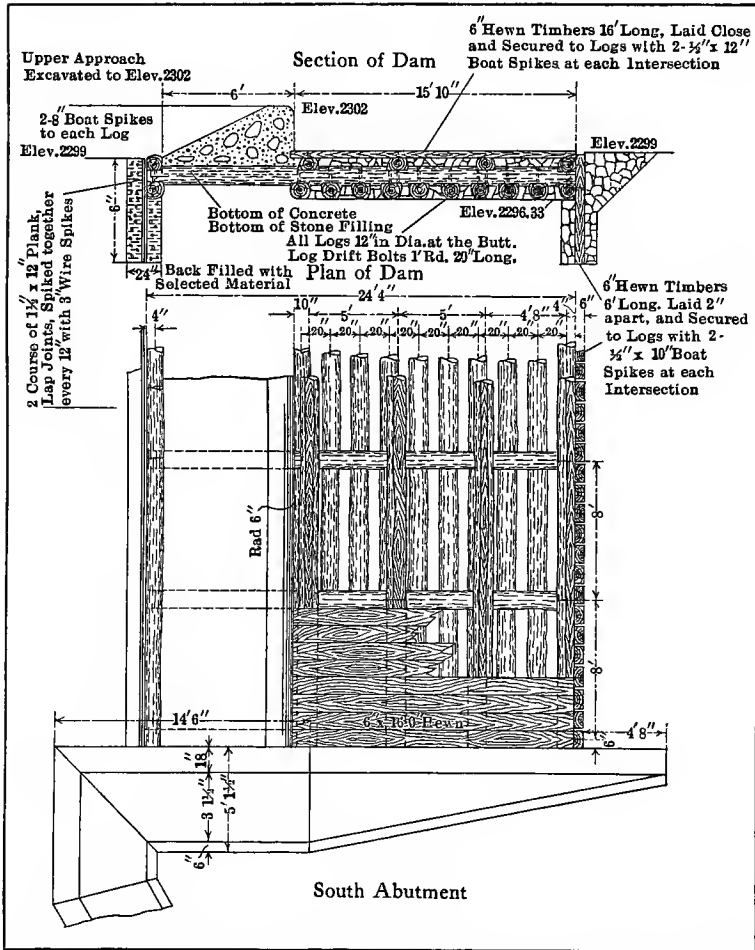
Concrete, rock and timber diversion dam, Yakima Project, Washington.
